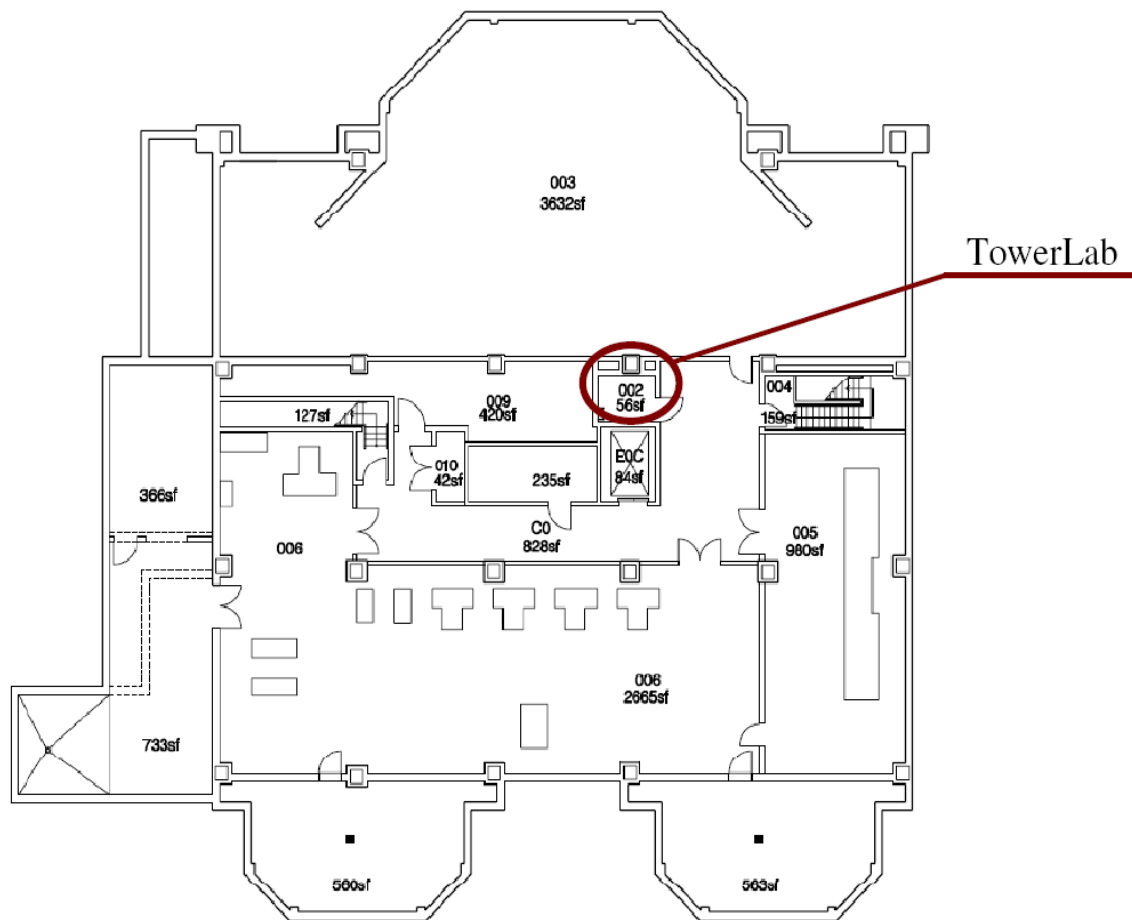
First floor level plan showing the location of the TowerLAB inside the Joe C. Richardson building (Fernandez et al. 2010).
